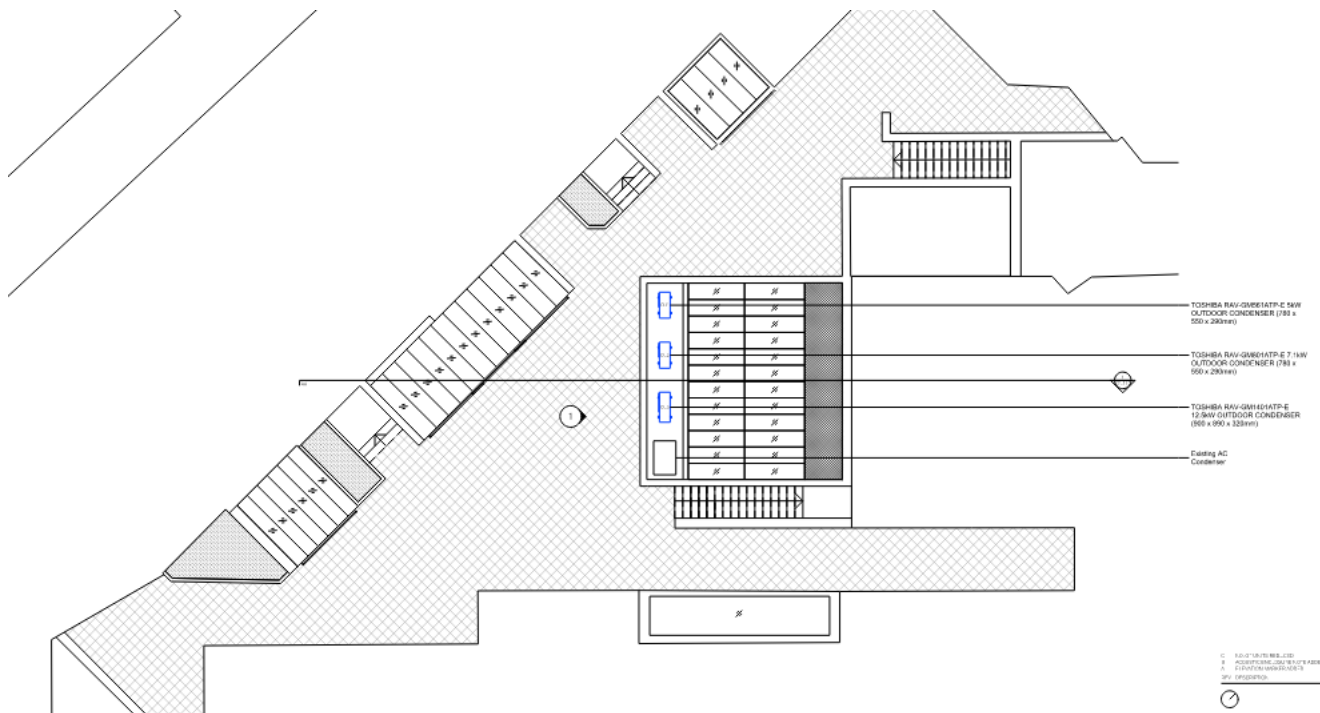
Proposed roof plan with the revised three air condenser rather than the four previously proposed.
